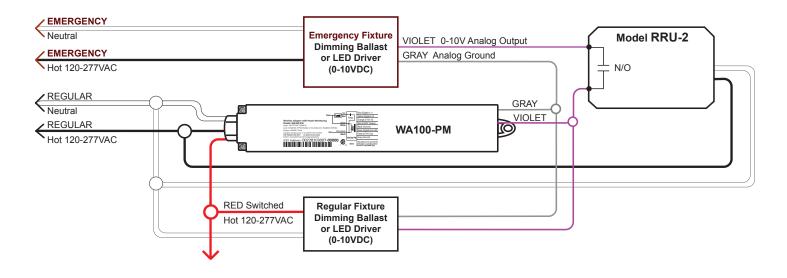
Emergency and Regular Light Fixtures: Wiring to Dim while Regular Power is Available
